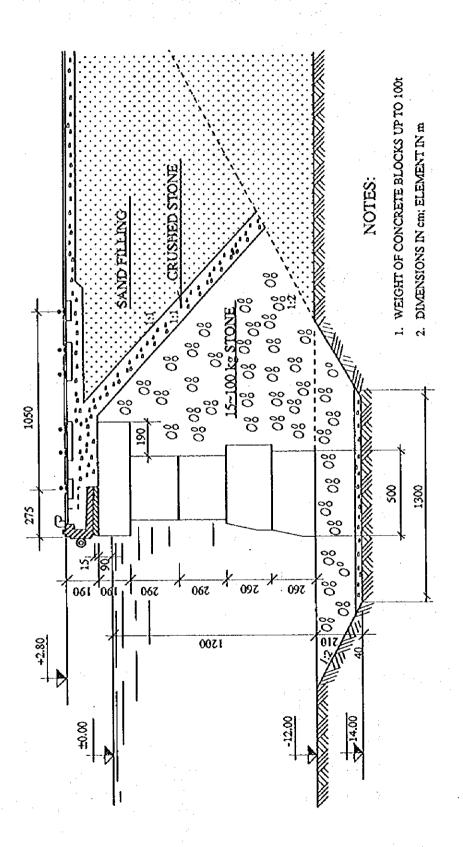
Standard Cross Section of Quay Block Type (-12.0m)
